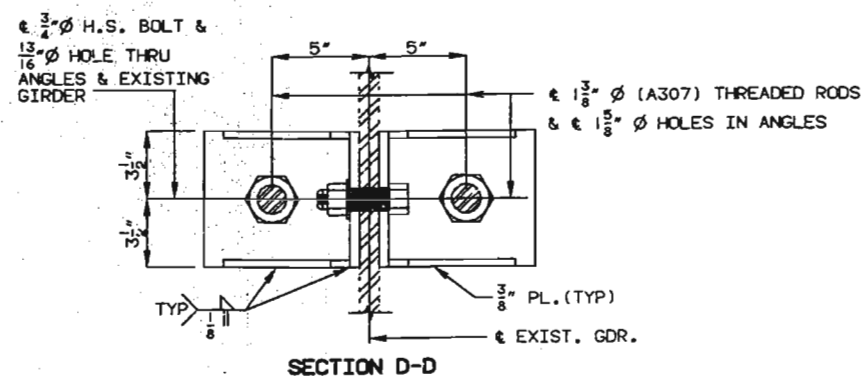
DETAILS SHOWING EXISTING HINGE NO. 11 CONNECTION
